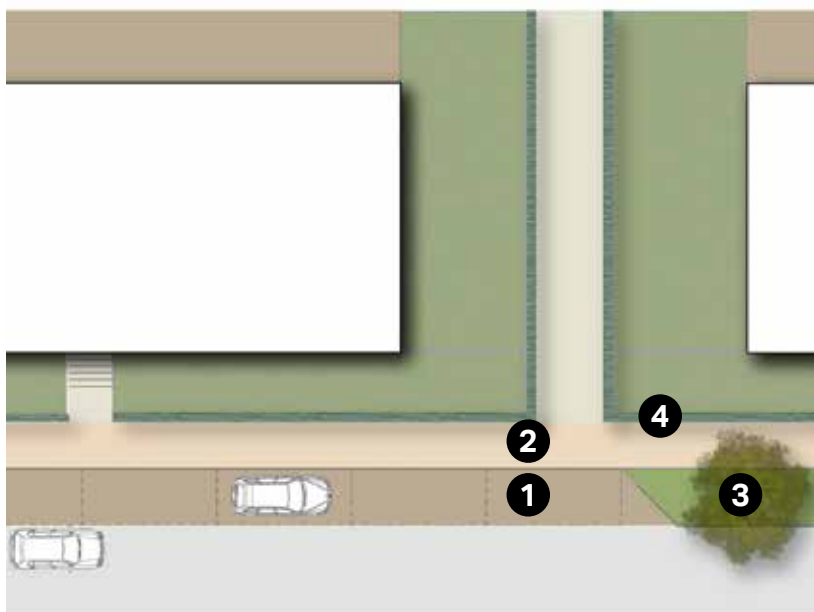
Illustrative diagram showing an indicative layout of on-street inset parking.
